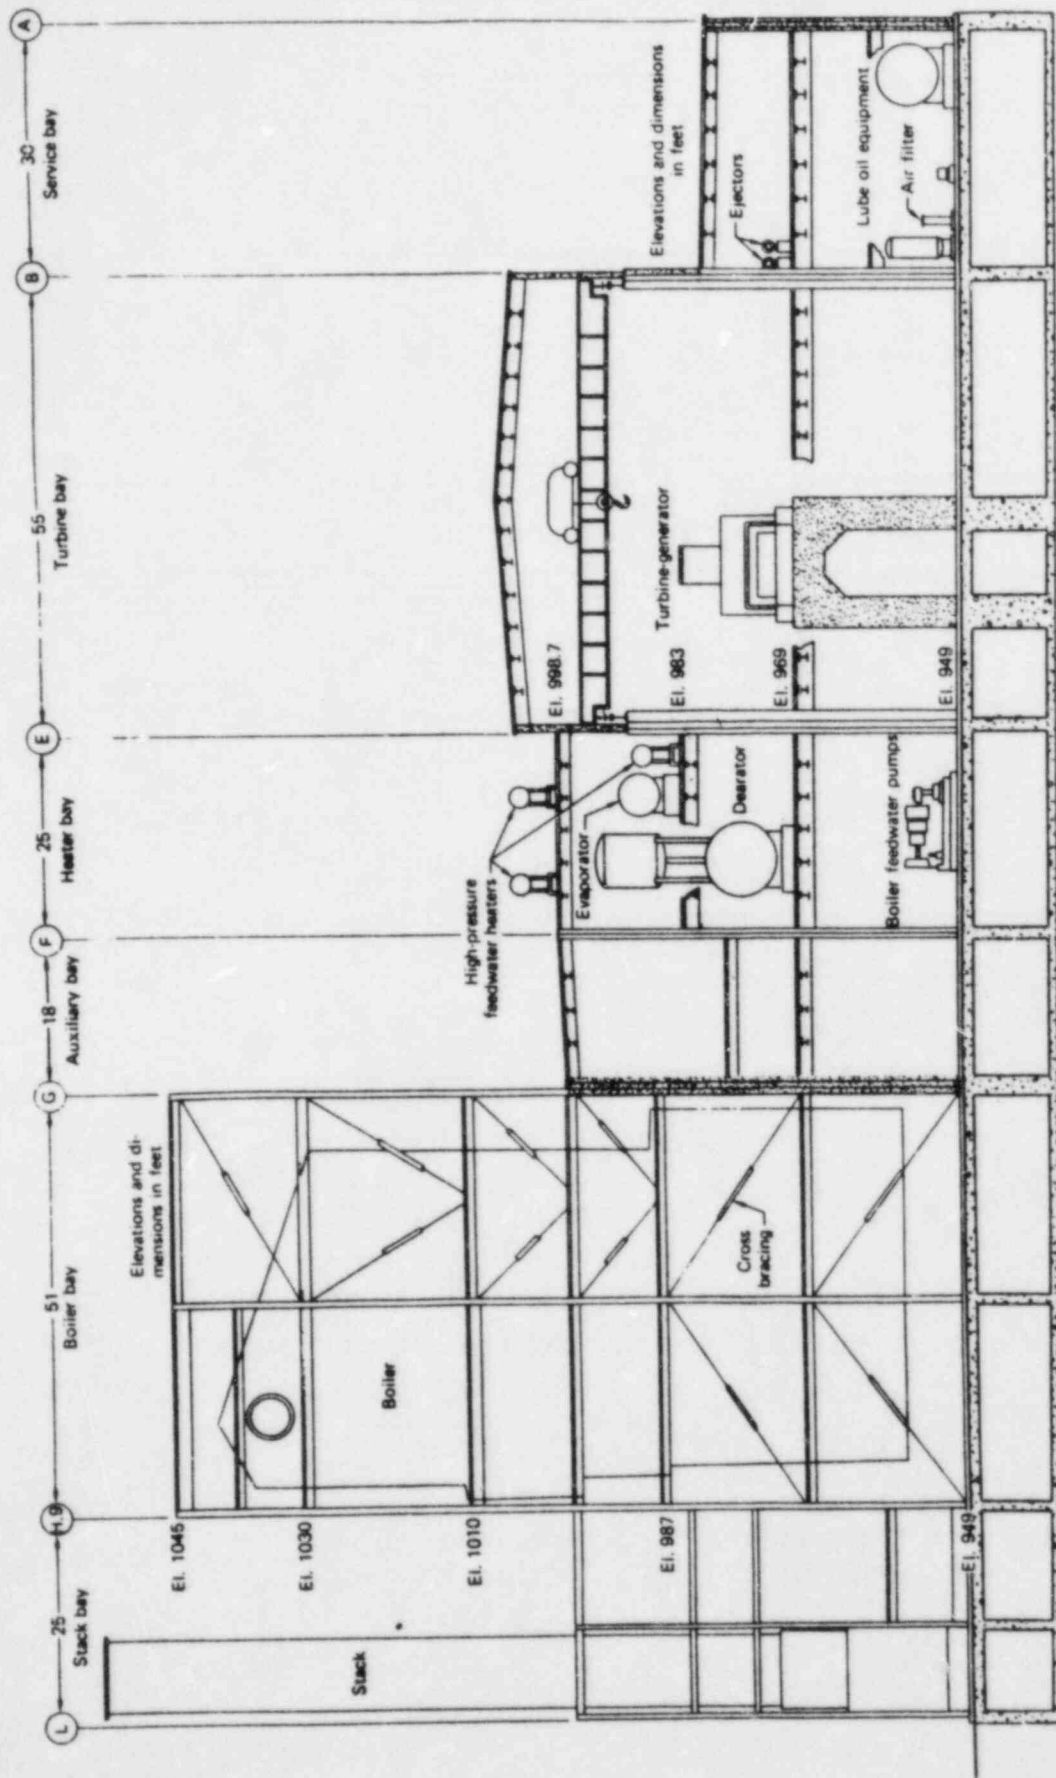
ELEVATION DRAWING, LOOKING NORTH, OF THE EL CENTRO STEAM PLANT, UNIT 4 (REFERENCE E-1)
